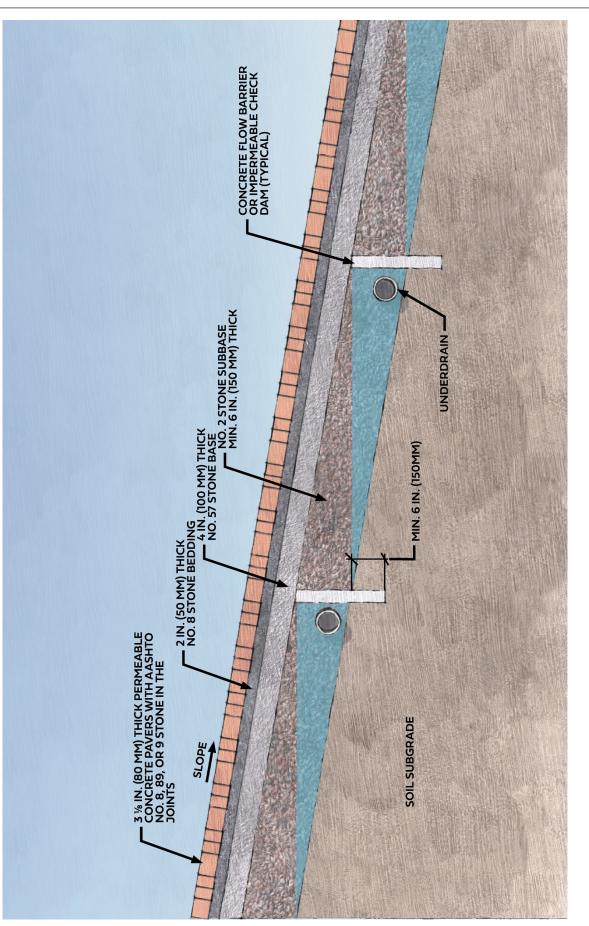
STEPPED PERMEABLE PAVEMENT SYSTEM INSTALLATION SECTION VIEW (NOT TO SCALE)
